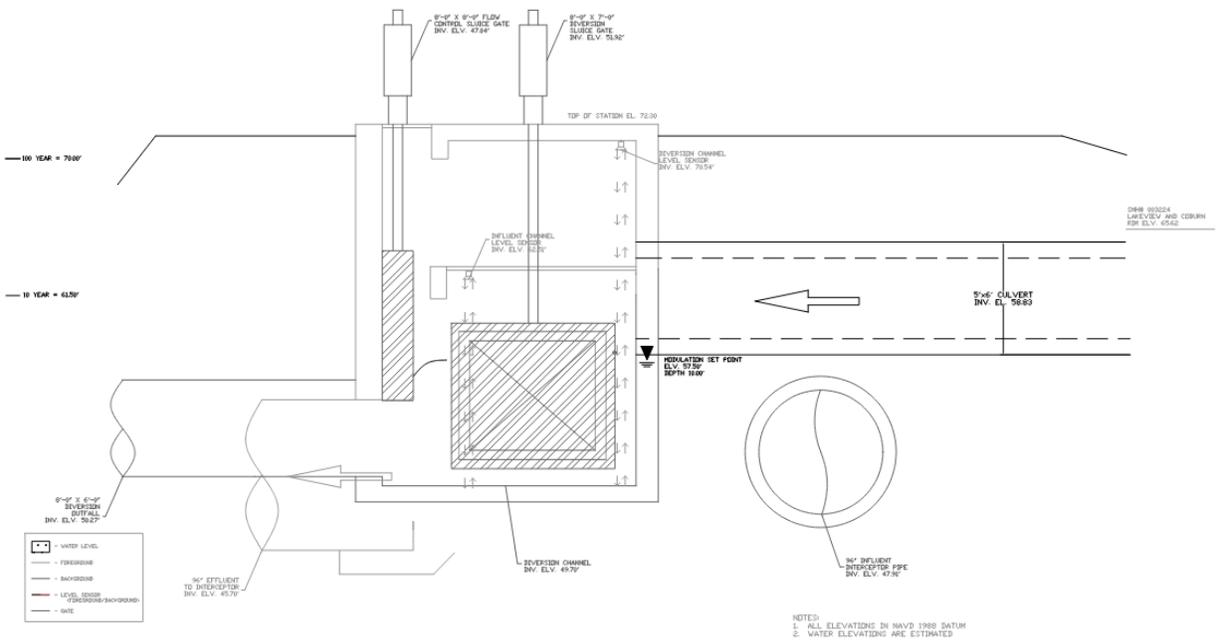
West Station Diversion Chamber Connection (South profile)
